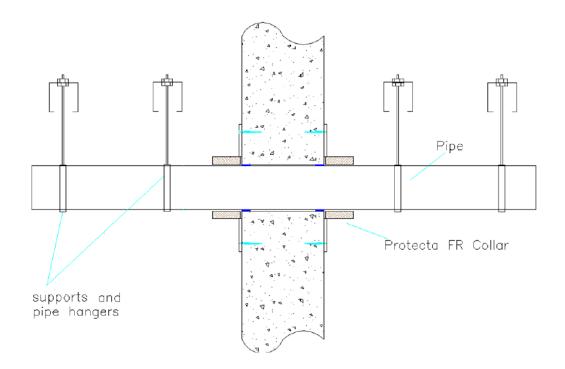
General arrangement of plastic pipes protected with Protecta FR Collar installed at both sides of a rigid wall
